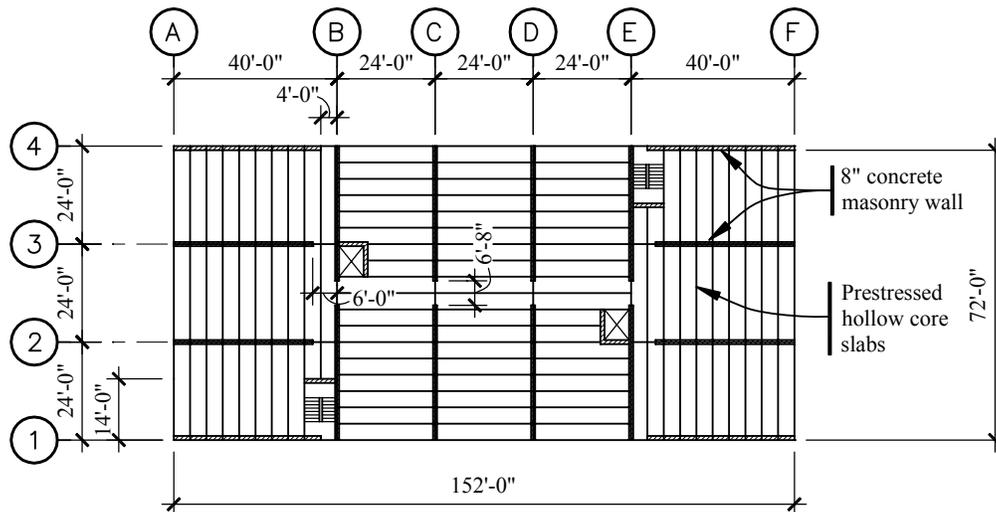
Typical floor plan (1.0 in = 25.4 mm, 1.0 ft = 0.3048 m).
